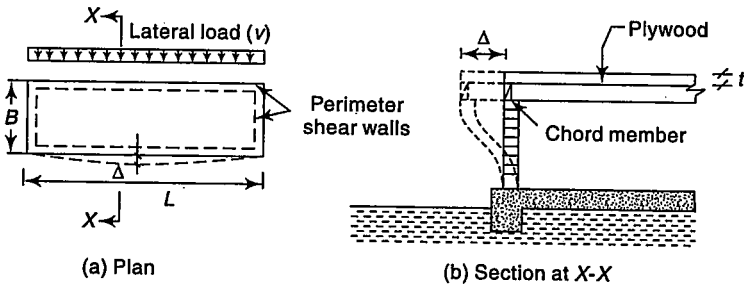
A typical horizontal timber diaphragm—the effect on supporting walls on deflection under lateral loading
